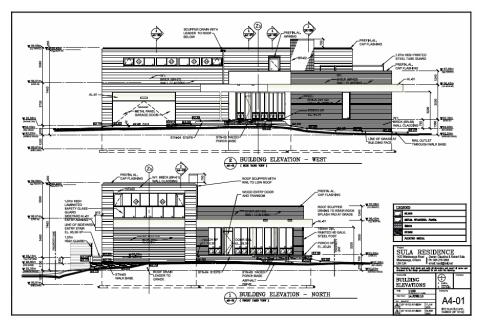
Proposed residence at 1422 Mississauga Road, west and north elevations. (Image provided by the property owner.)
